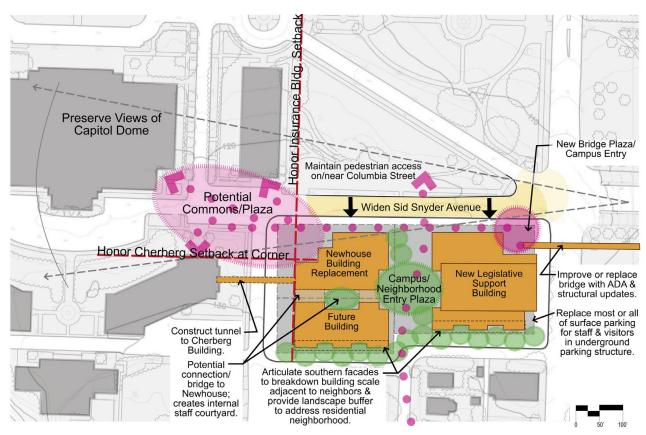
SOUTH EDGE CAMPUS PLAN, 2007
